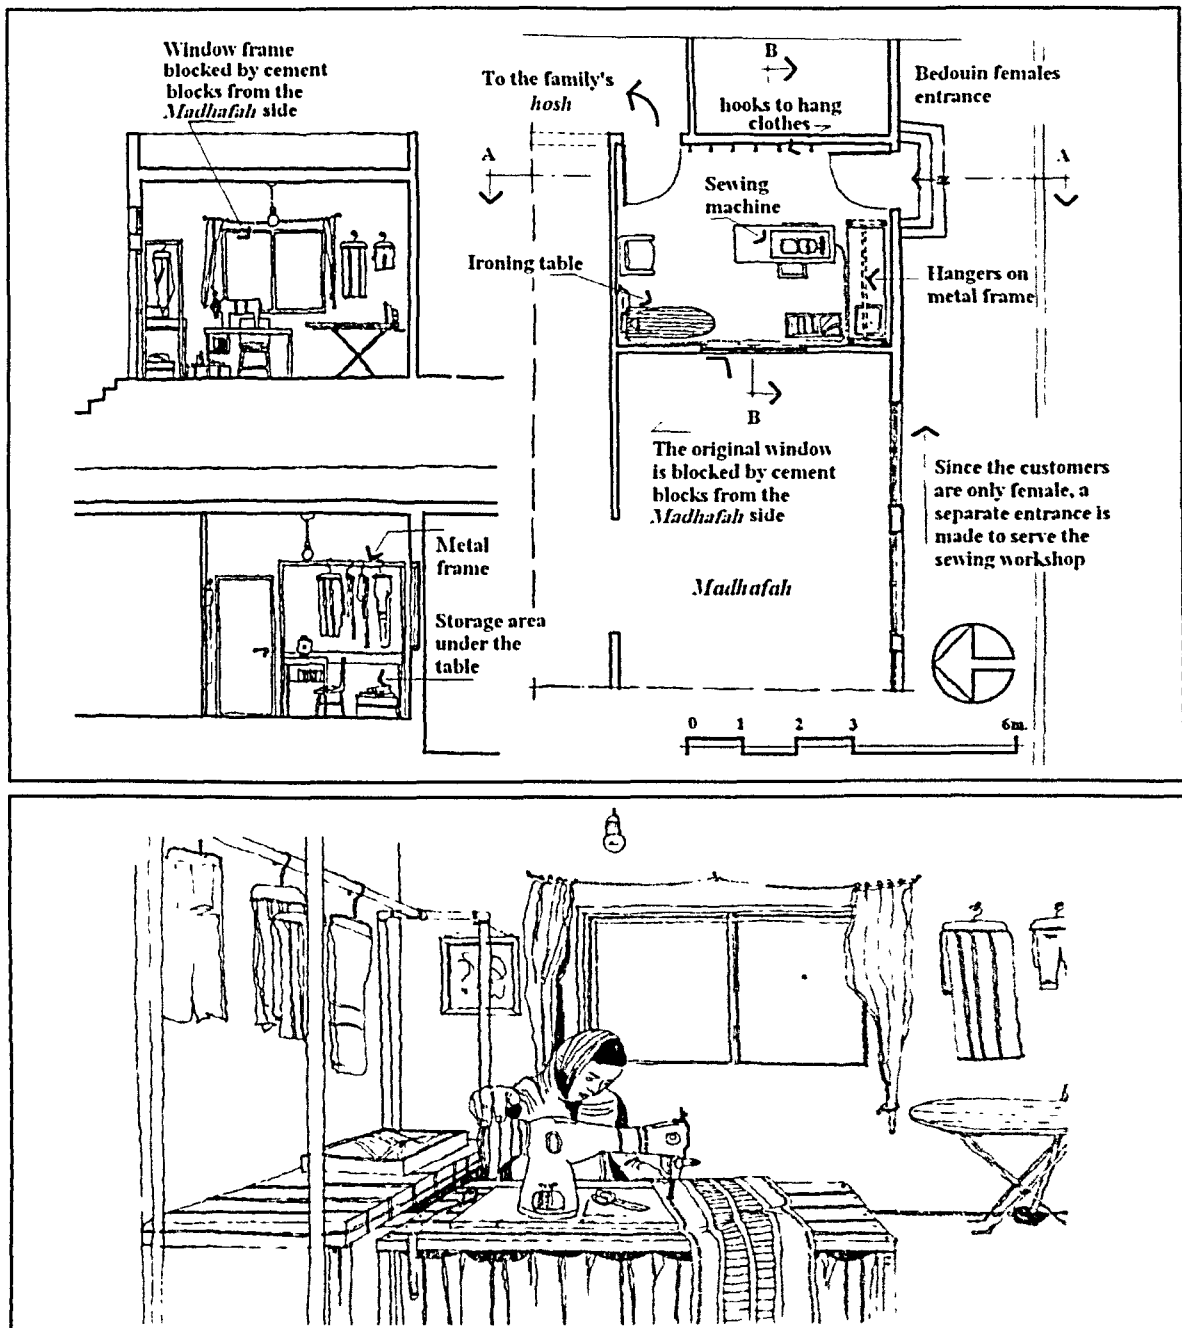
The first image shows Ahmad's wife sewing workshop plan and sections.
